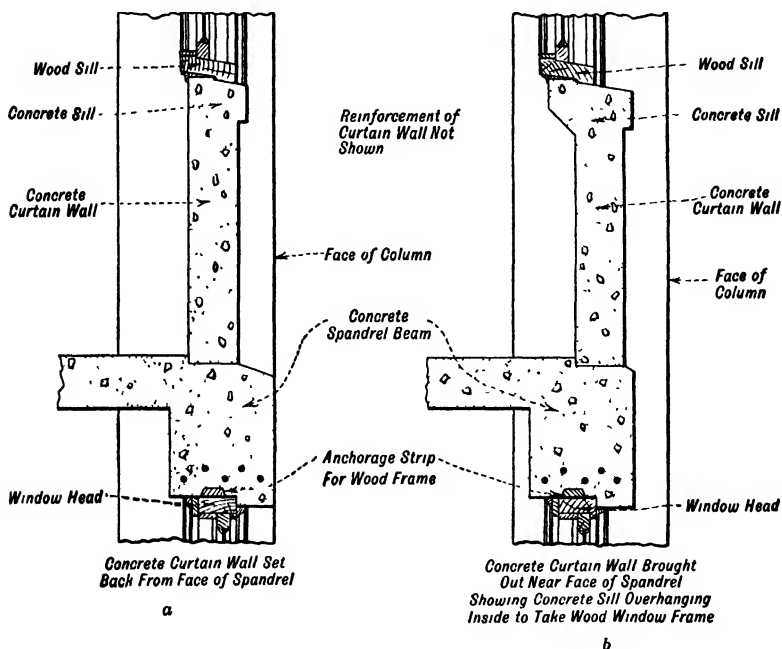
Sections through Spandrel Beam. Concrete Exterior. (See p. 731.)
